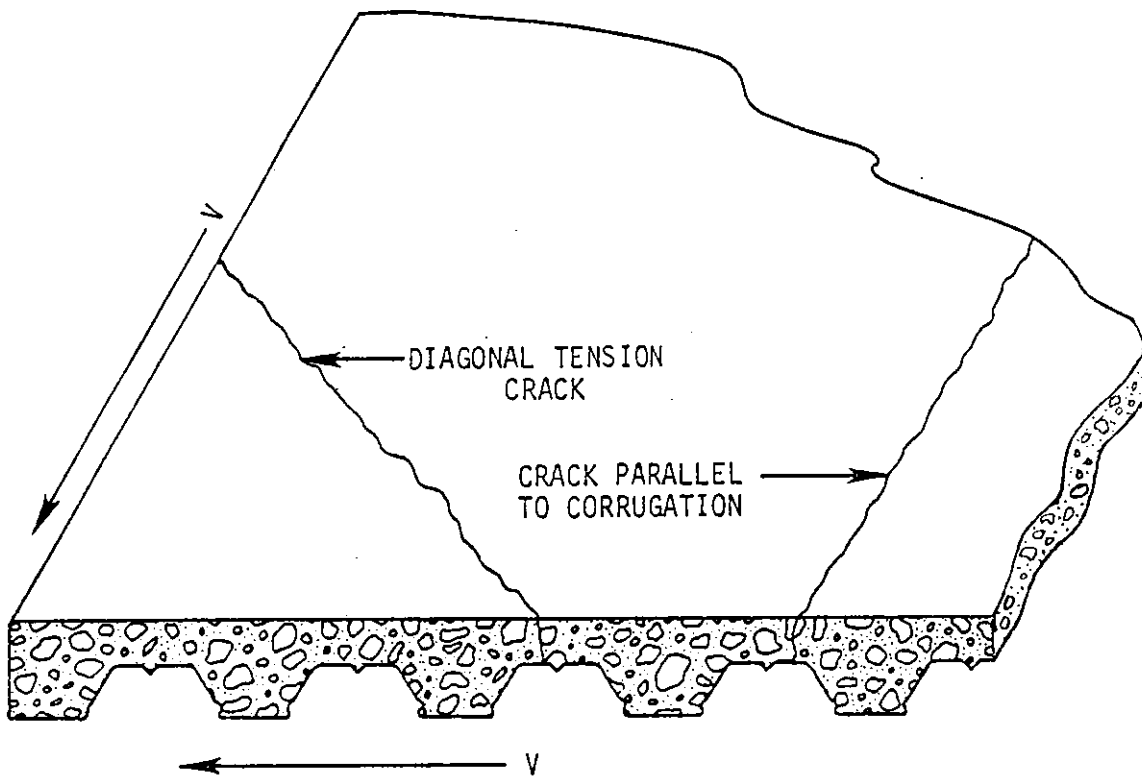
Composite slab failure. a) diagonal tension (Failure Mode 1.a.1); b) crack parallel to corrugations (Failure Mode 1.a.2) [15]
